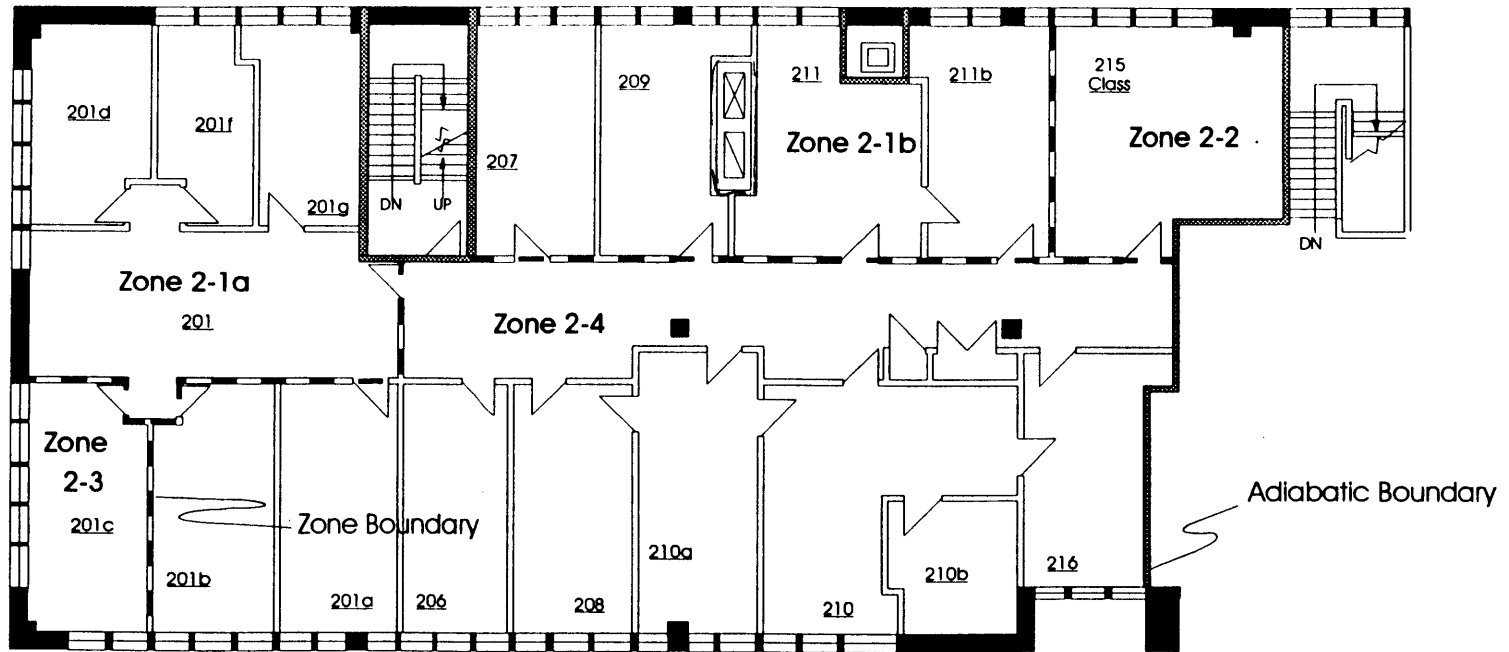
Building E51 - Second Floor Level Zoning Option 2C
